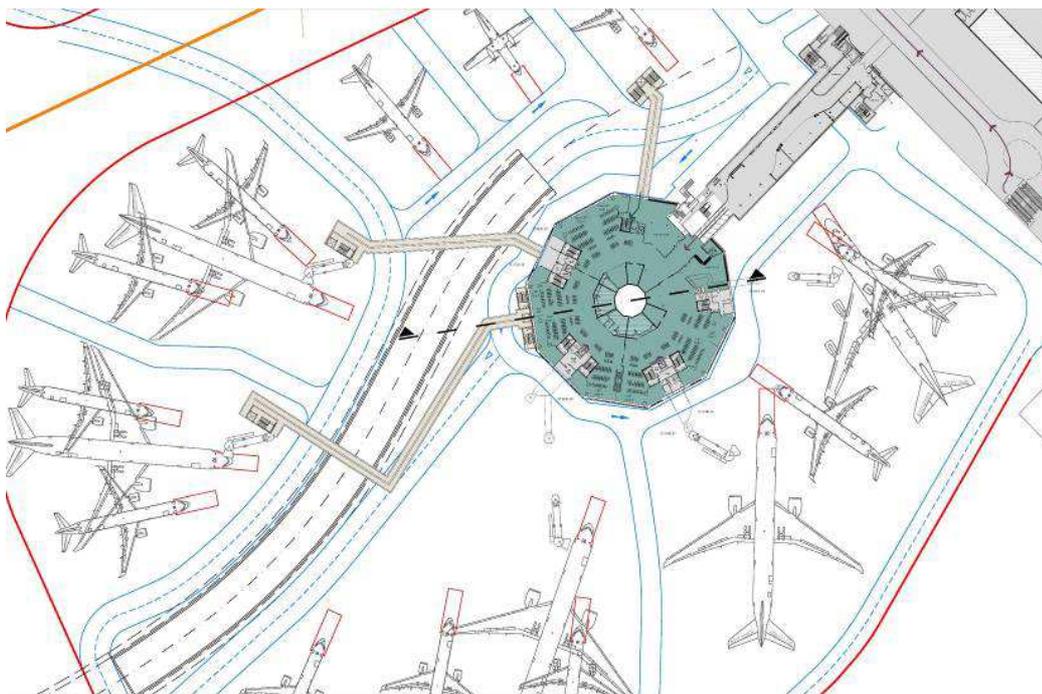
Plan view of proposed Pier 3 realignment of stands
